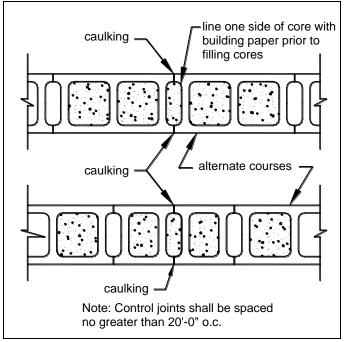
TYPICAL CONTROL JOINT DETAIL
